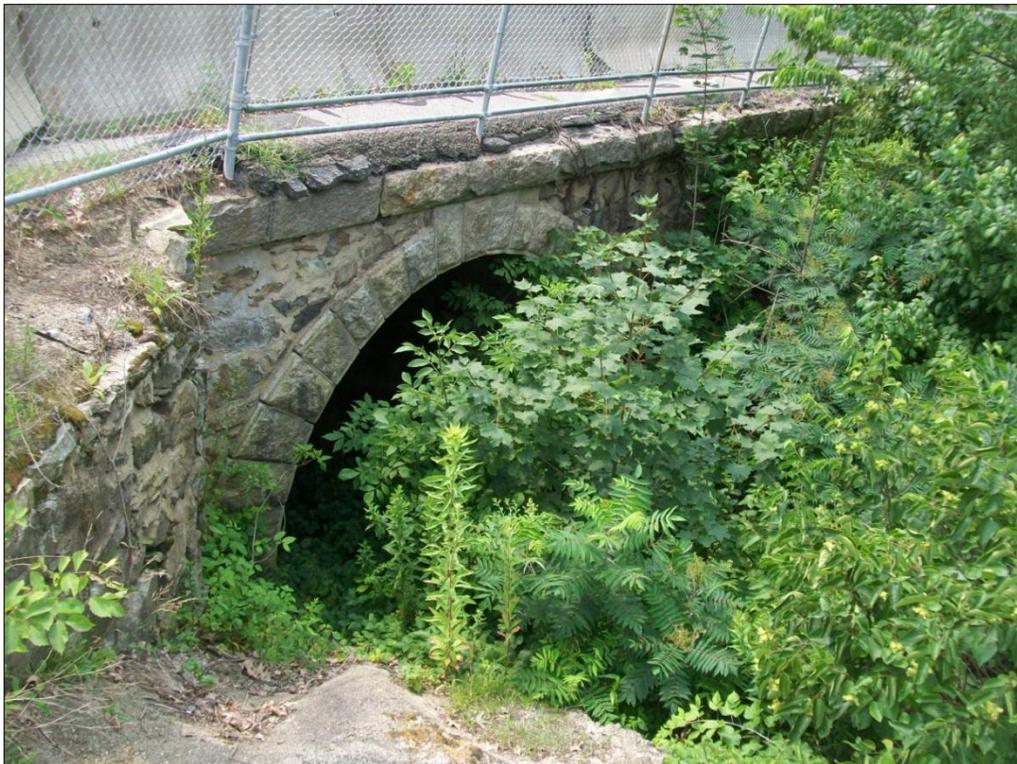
Looking Southeast: Smaller Arch Showing Heavy Vegetation Growth
